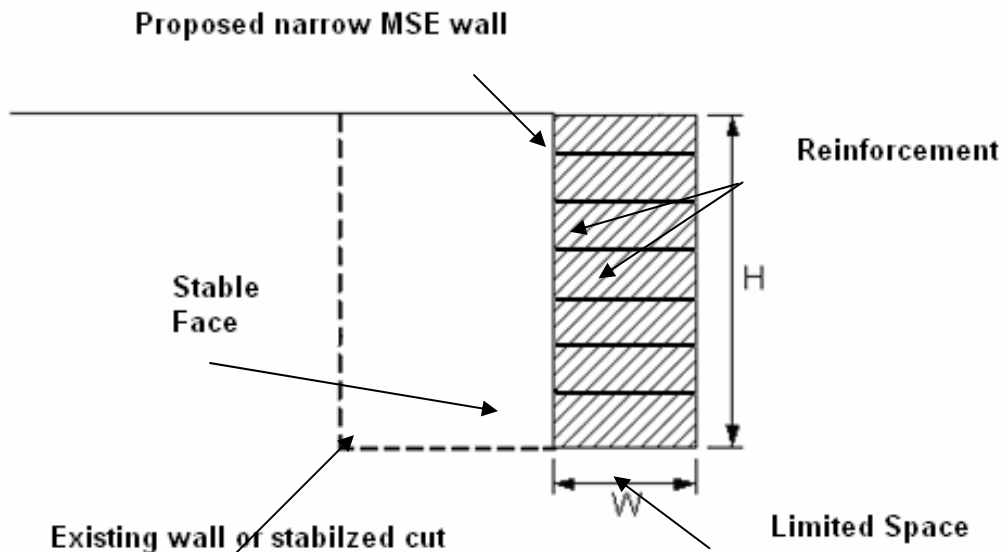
Illustration of proposed narrow MSE wall in front of an existing stable face
